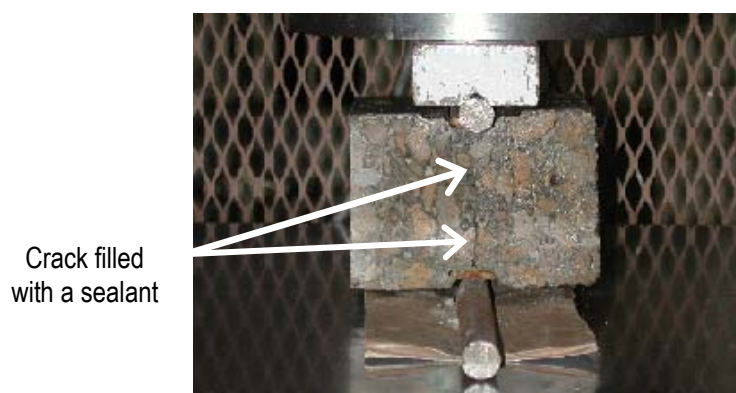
Setup used to test the bond strength of the crack sealant specimens
